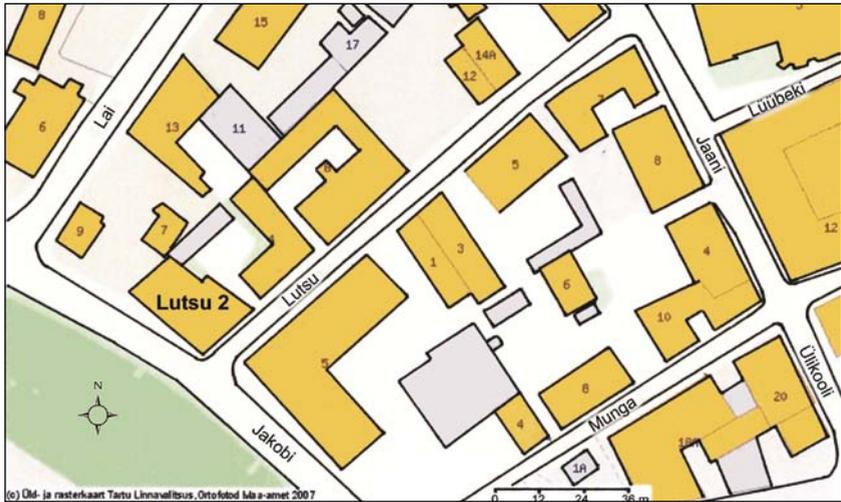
The situation plan of 2 Lutsu Street. Kristel Külljastinen.
